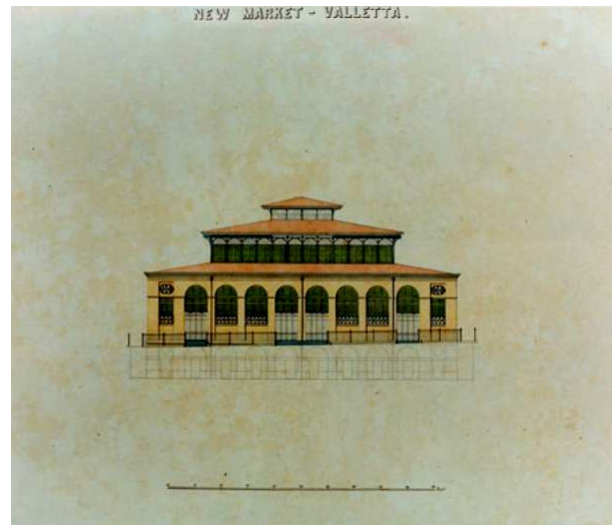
Elevation along St Paul's Street (© Records and Archives Section, Public Works, Malta).
